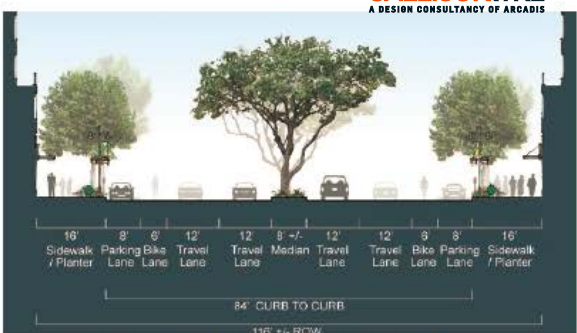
SALT LAKE BLVD - SECTION OF POTENTIAL ENHANCEMENTS
